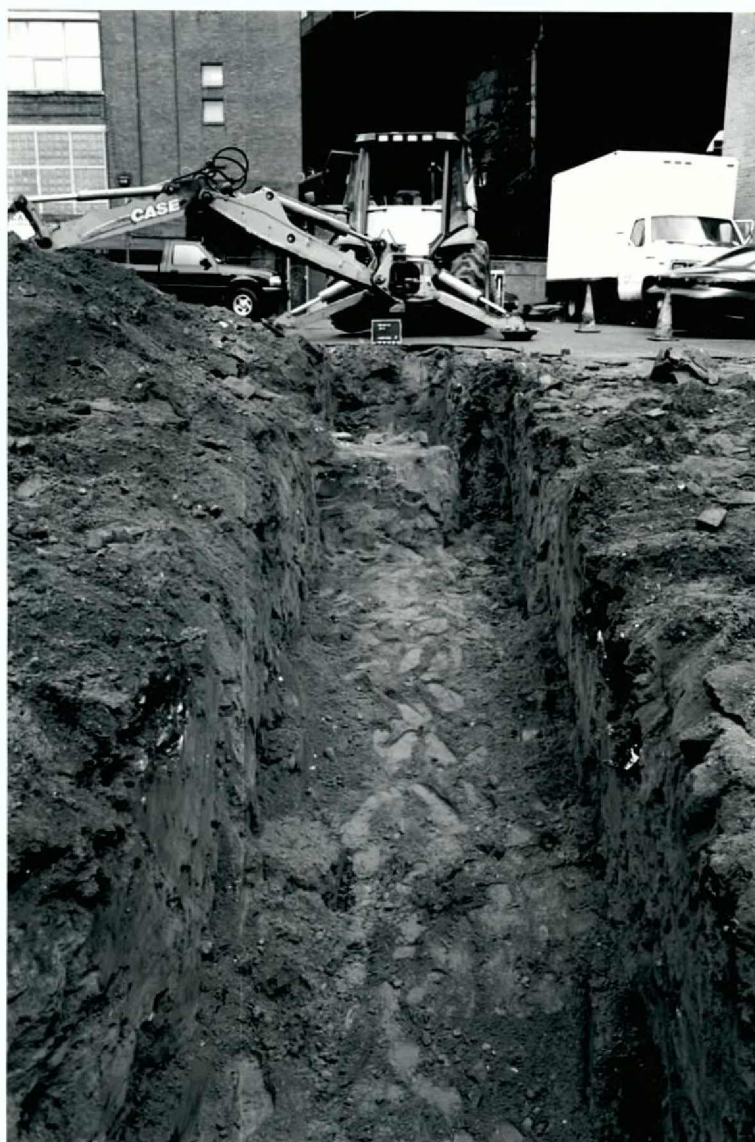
View of Backhoe Trench 5 looking south with dry well in background.
